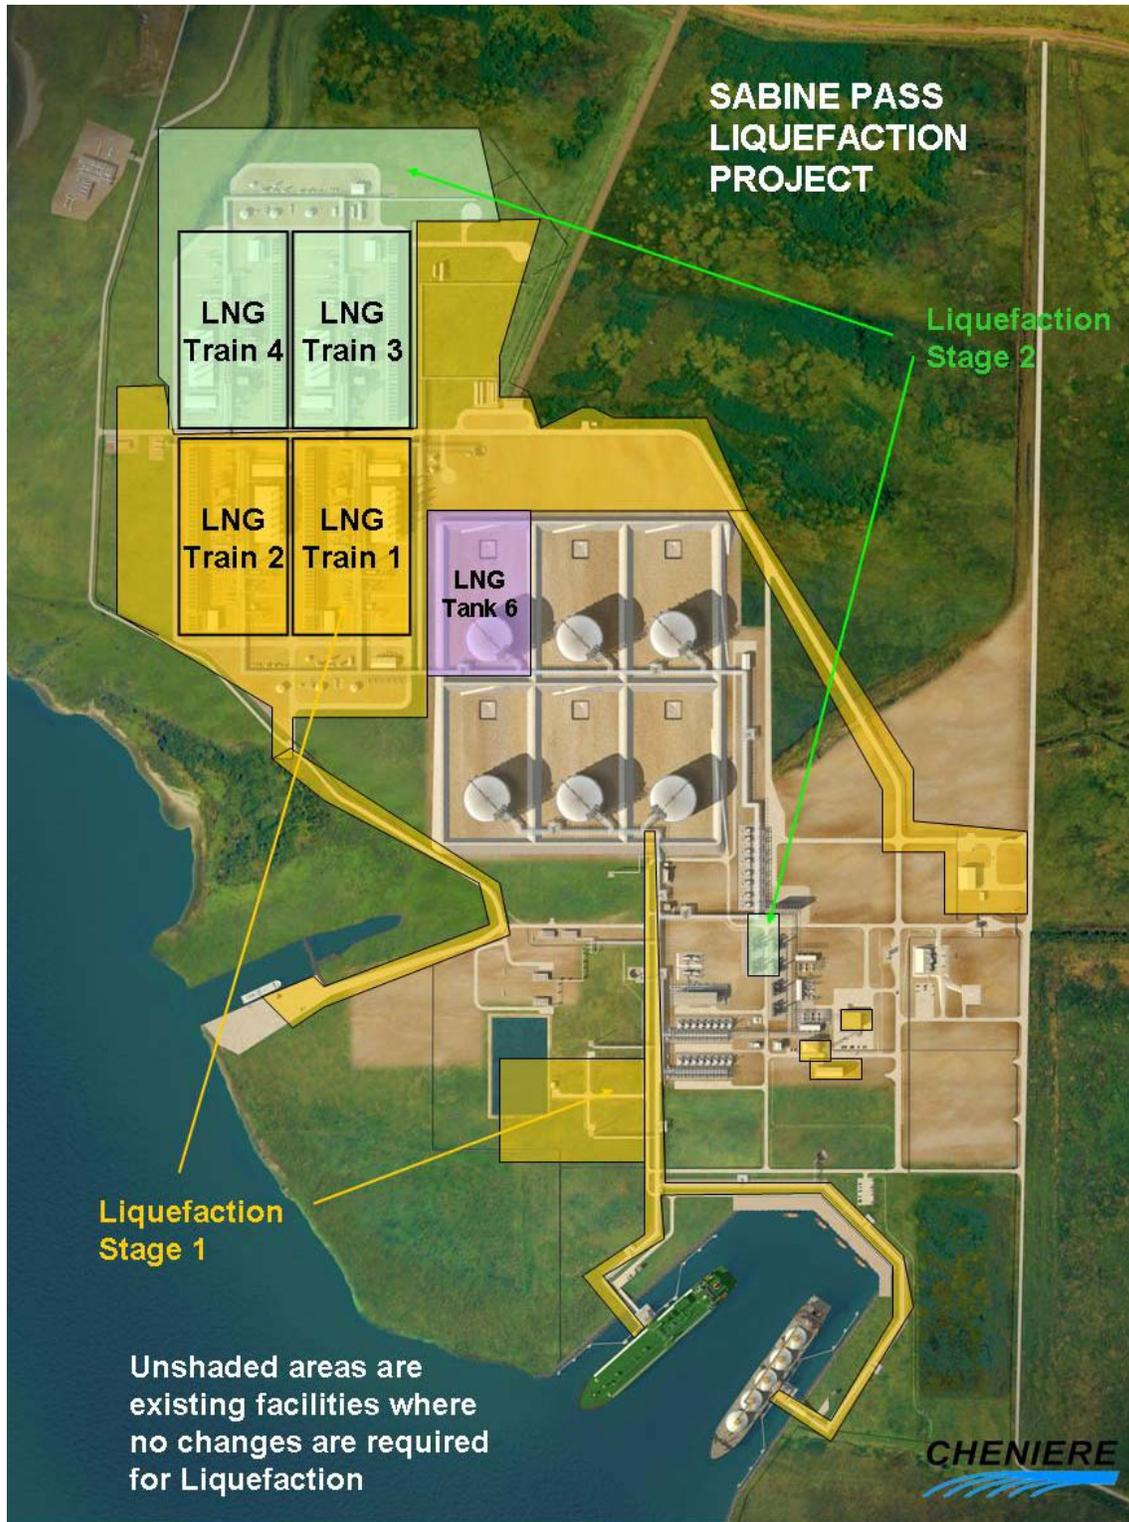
Liquefaction Stage 1 and Stage 2, Artist Impression – Plan View
